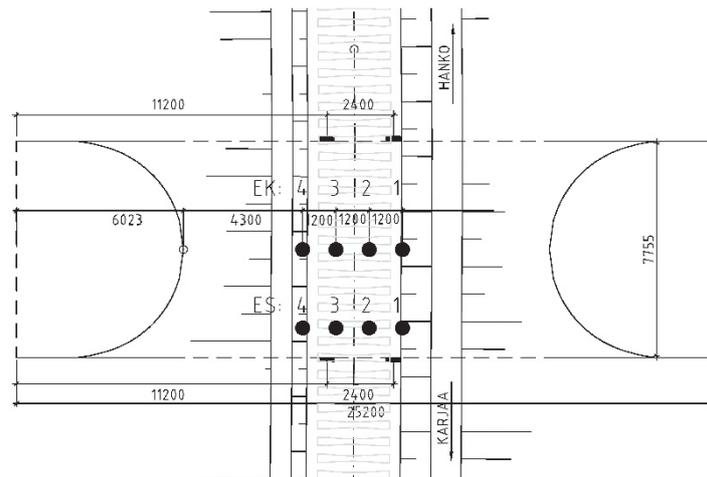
A plane view and cross section of culvert and location of monitoring points
